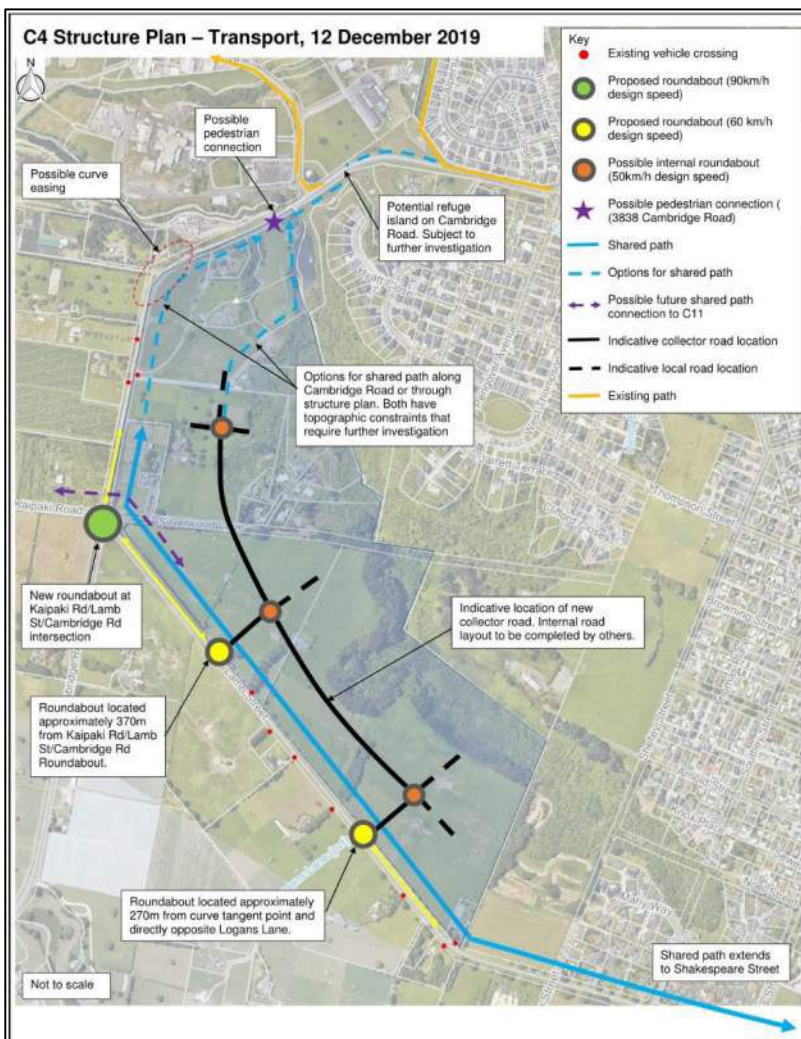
Structure Plan – Transport Layout (refer Appendix for larger copy))
